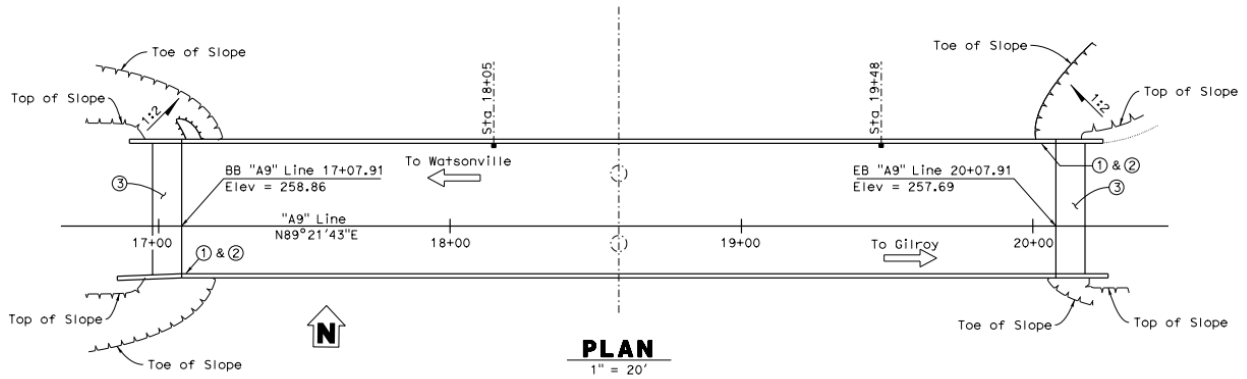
Schematic Plan View of OSB1 bridge (drawing provided by Caltrans)
